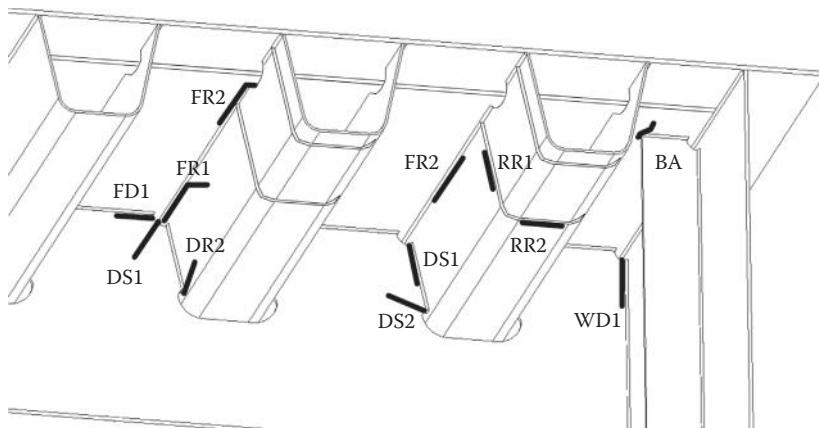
Modes of fatigue damage in orthotropic steel bridge decks.
